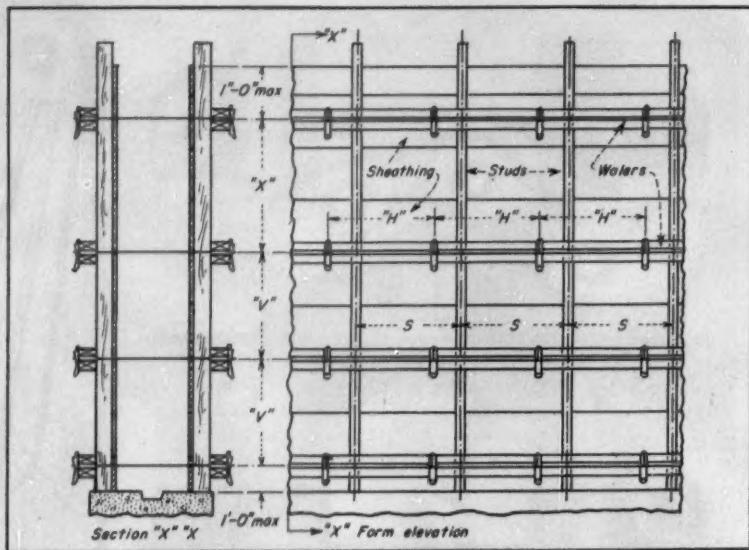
TYPICAL SPACINGS of ties and framing members for wall forms. Snap ties shown for light forms. Heavier ties must be substituted for 6,000 lb and over.
